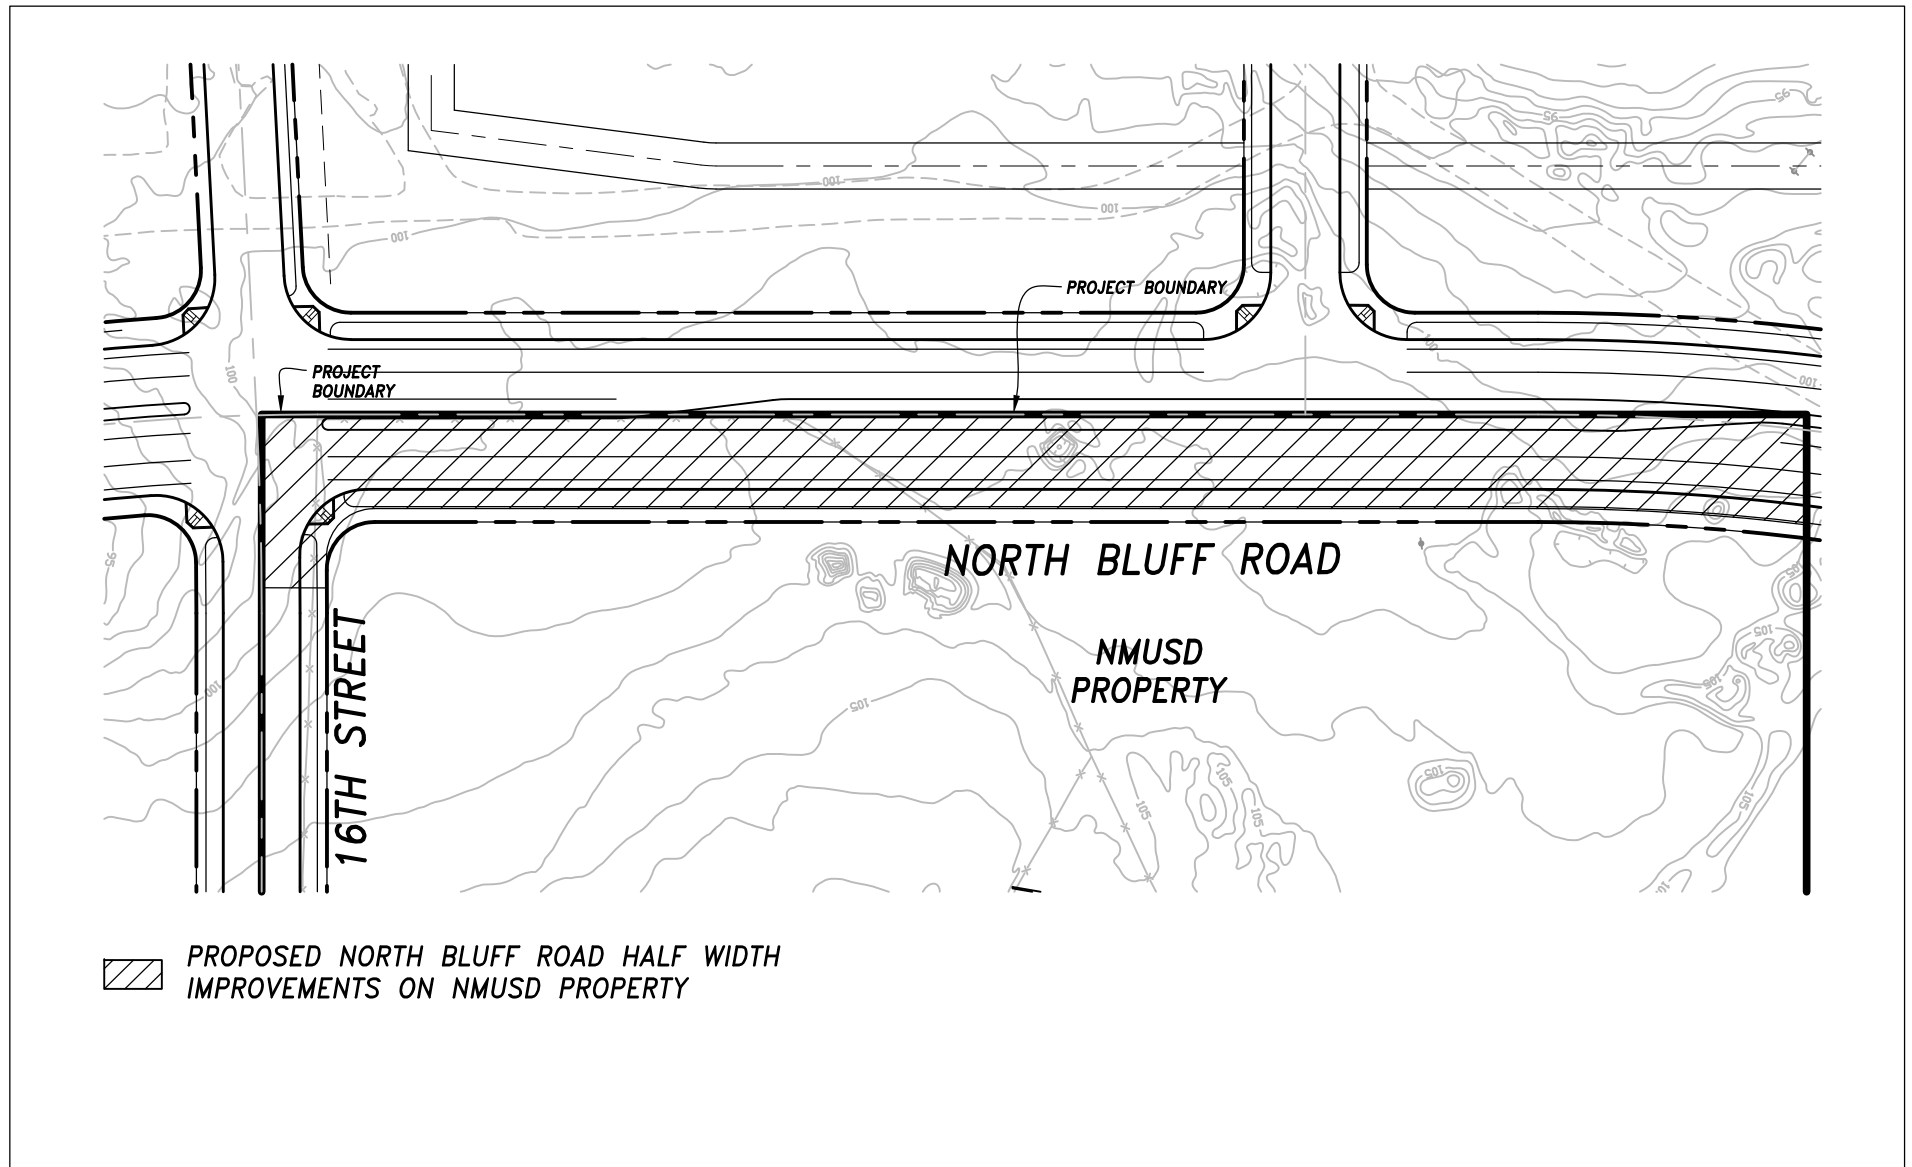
16th Street Entry and Off-Site Improvements
